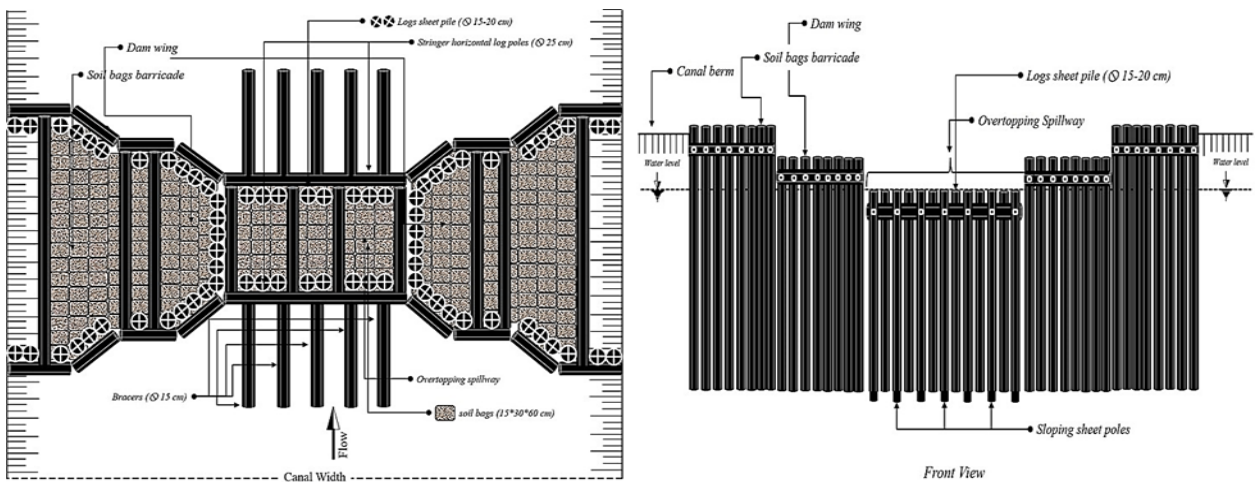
Two sheet pile box dam equipped with lowered middle crest spillway (CKPP Dam Model 1)
